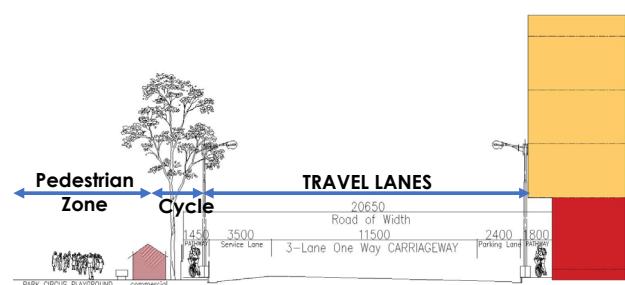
Proposed Cross-section of 21M wide Darra Road
